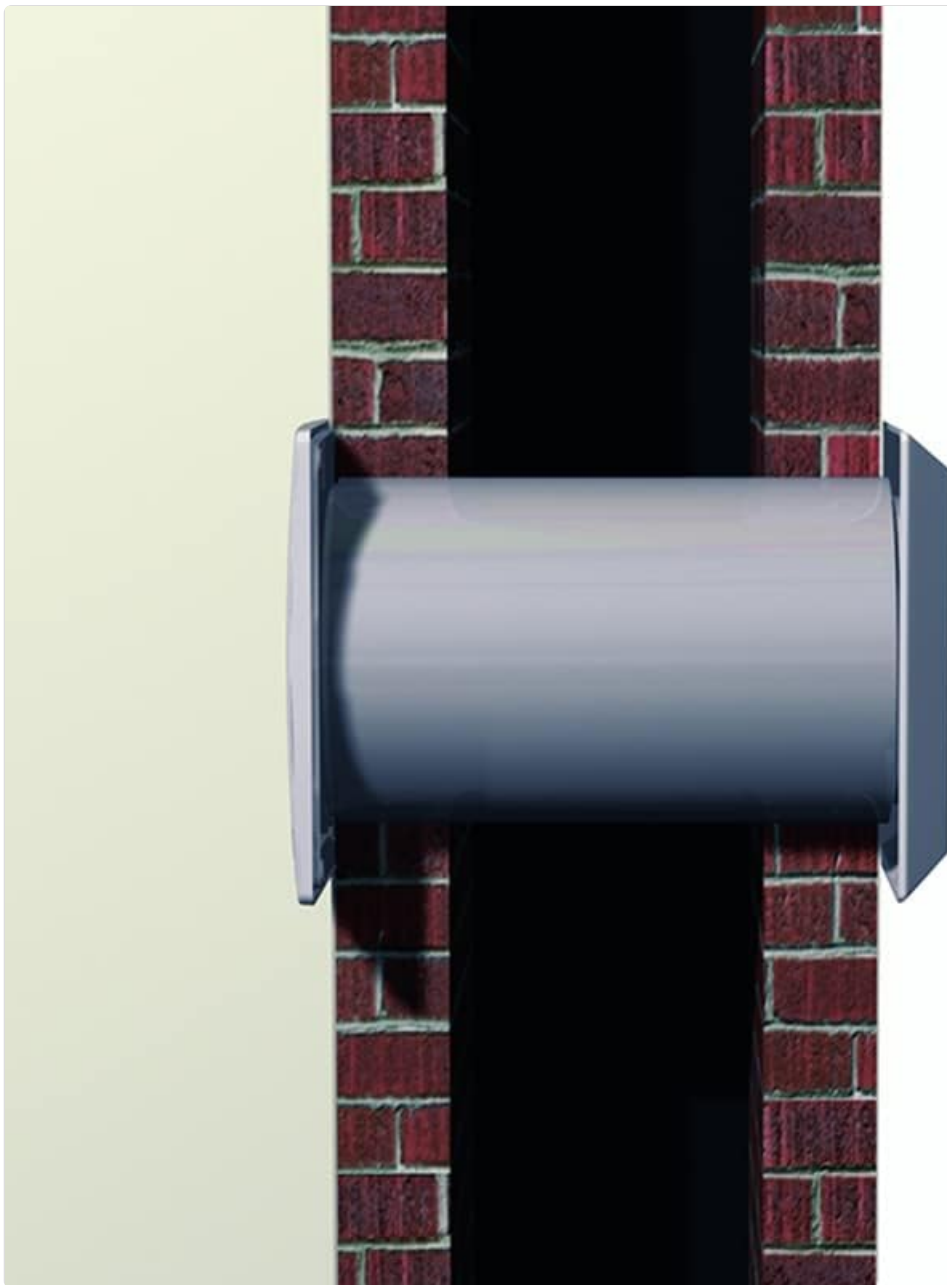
Cross-section view of Vortice Spiral Extractor Fan installation through a wall. This diagram shows the internal ducting of the fan passing through a brick wall, highlighting the through-wall installation method.
